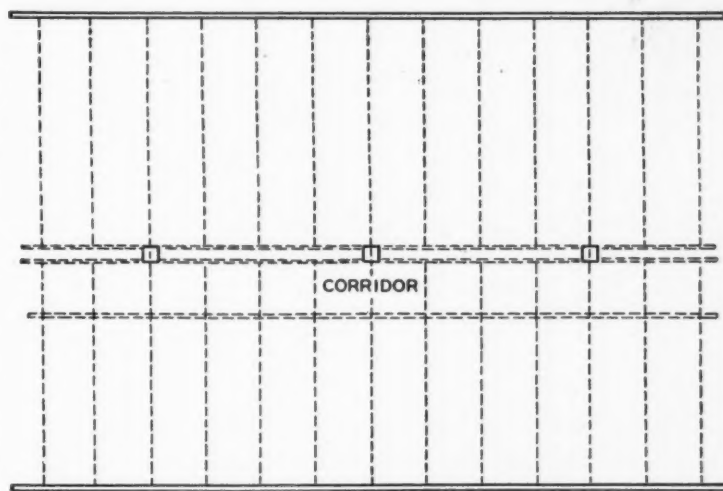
Arrangement of beams and girders in a typical section of the main laboratory building. The central corridor down one side of columns is indicated. The central columns are spaced on 24-ft. centers and the rooms on one side of the corridor are 27 feet deep and those on the other, 19 feet.
